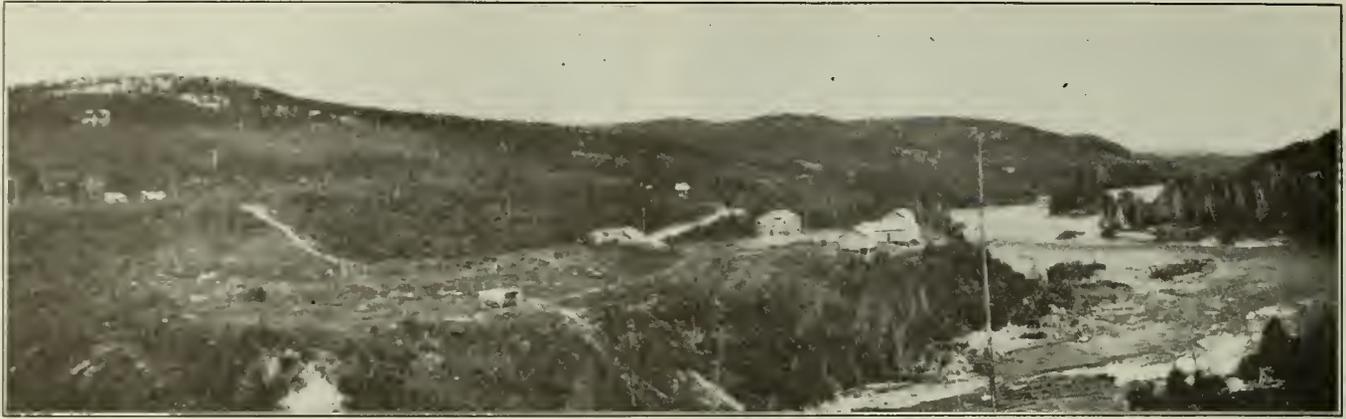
General View of the Site on June 14th, 1929, showing First Camp Buildings.
